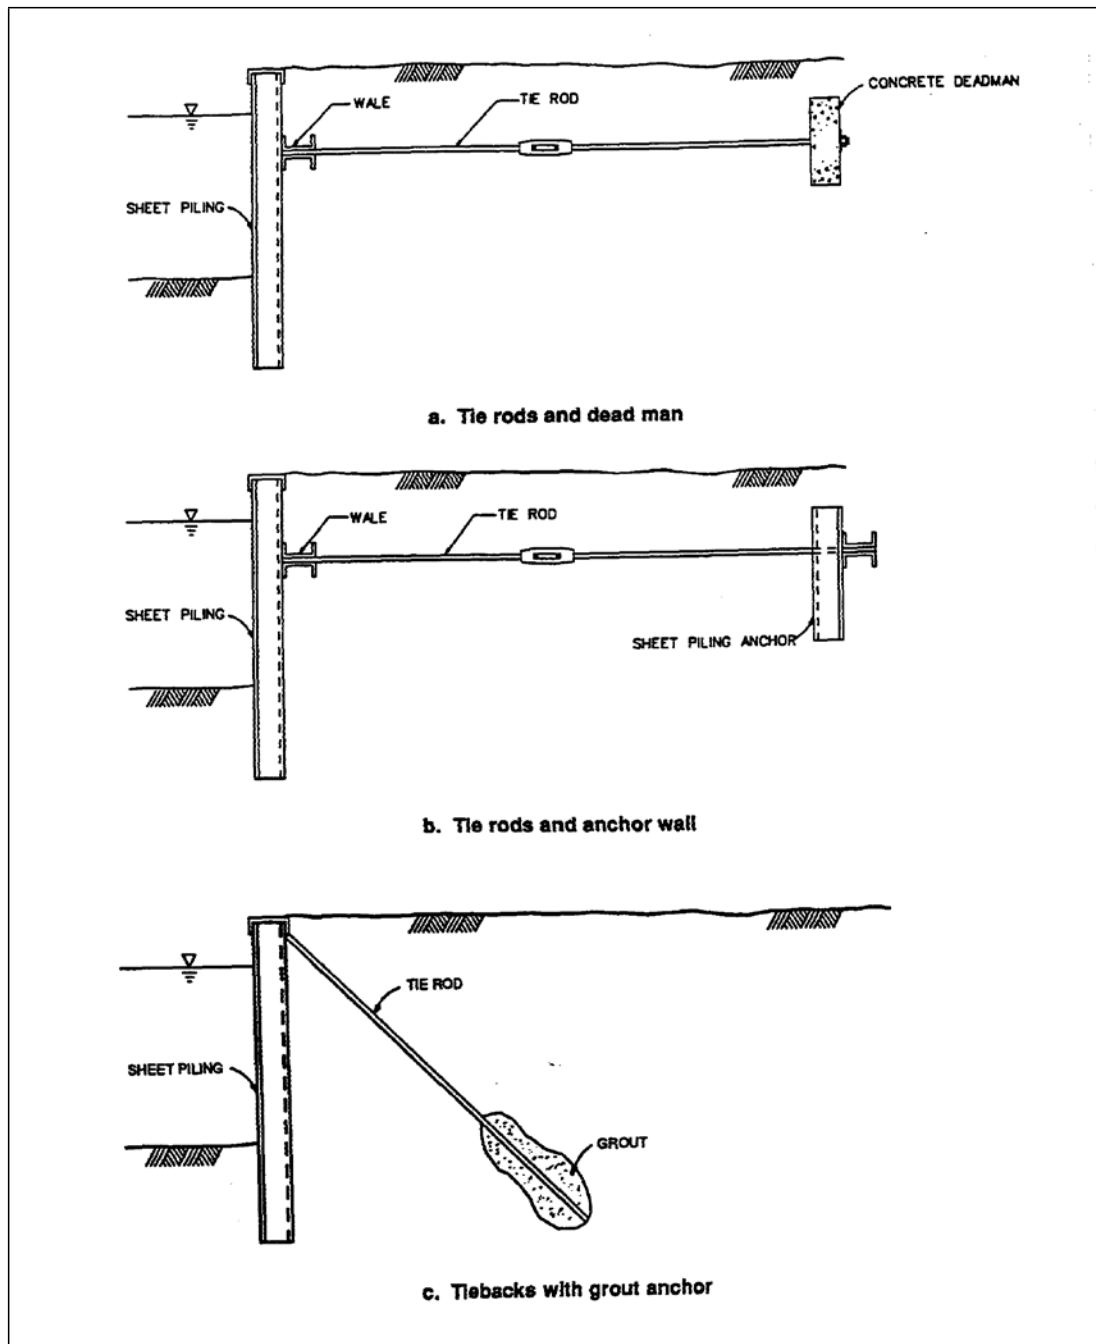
, A8b and A8c: Sheet pile walls with concrete deadman (a), sheet pile (b) and grout anchor systems.
